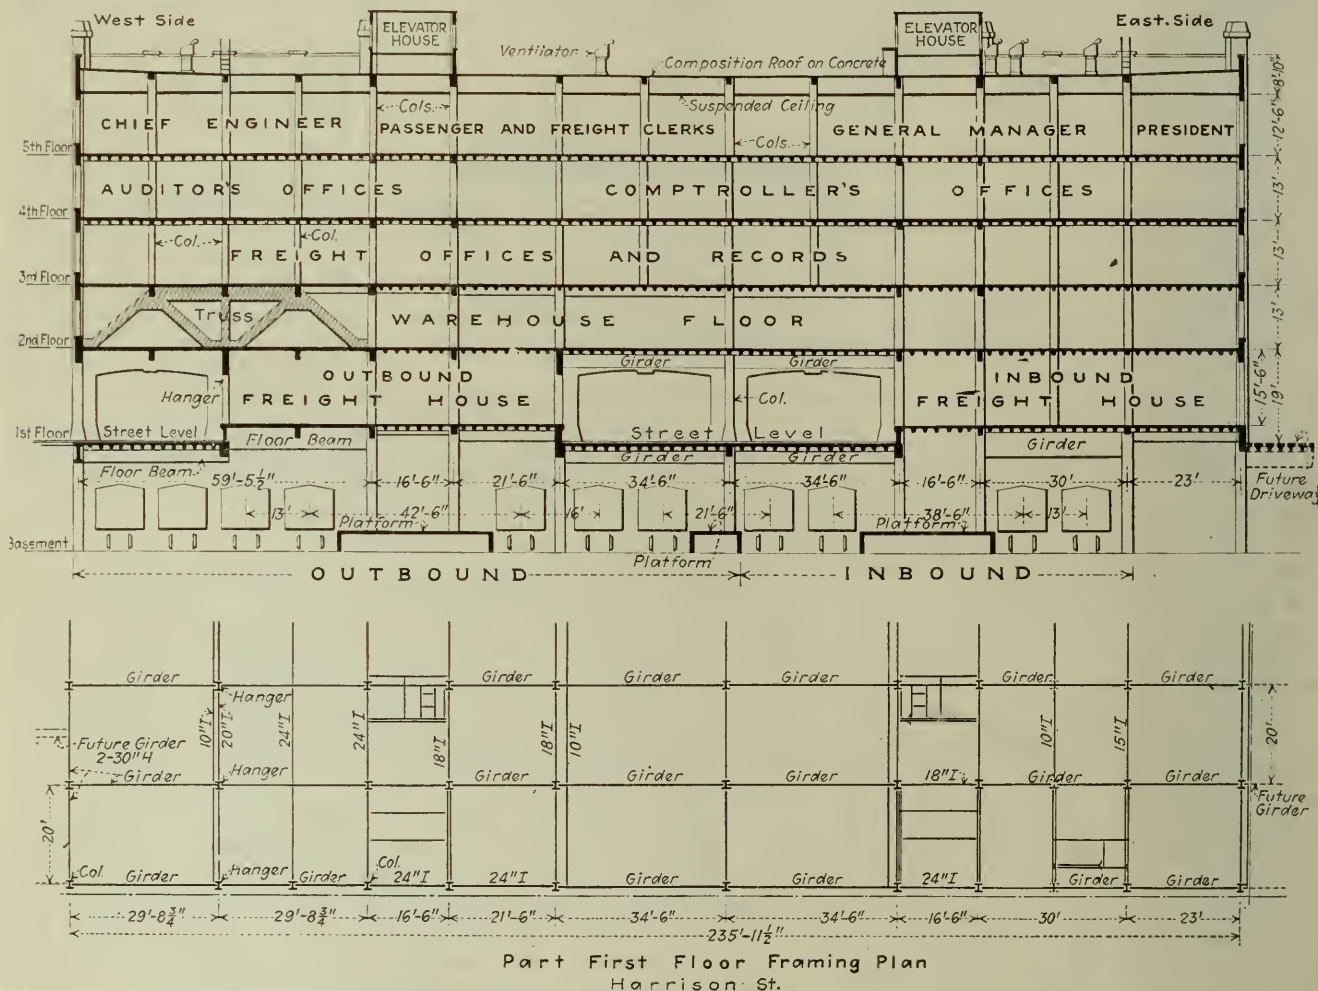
SIX-STORY FREIGHT AND OFFICE BUILDING, CHICAGO & ALTON R.R.
